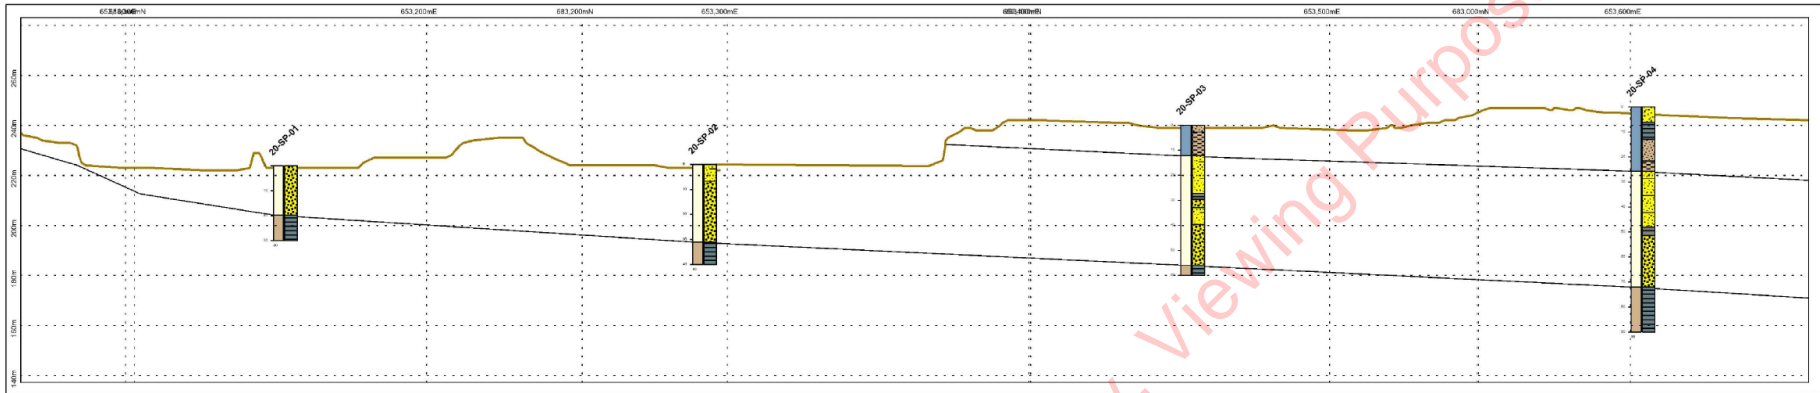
Schematic Cross Section through NW-SE Plane.
